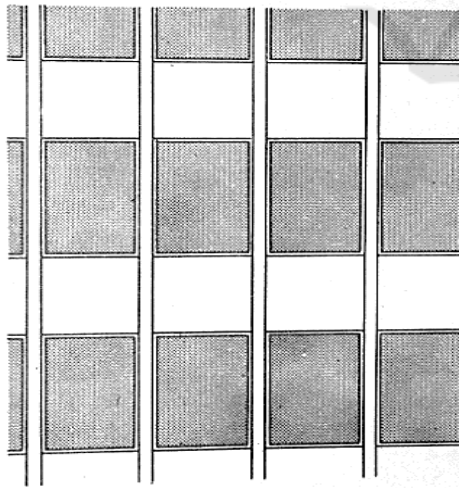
Examples of envelopes, placed behind the structural plane - clear visibility of the structural pattern.
